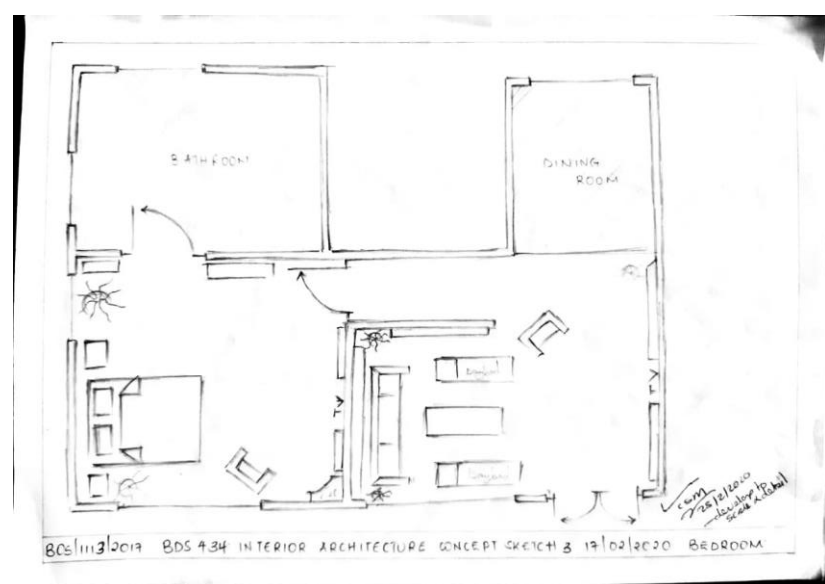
Interior Architecture concept sketch (Source; Author)
